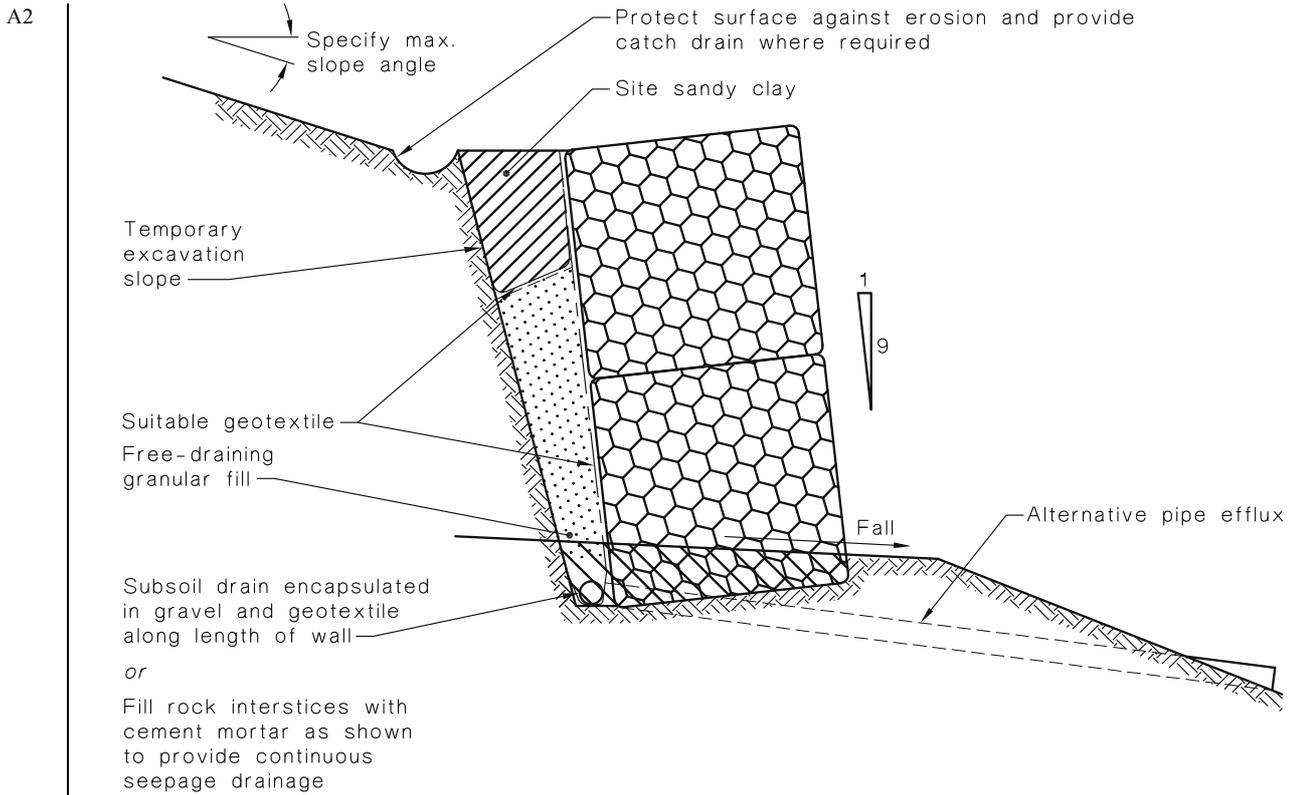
TYPICAL SECTION—GABION WALL DRAINAGE
